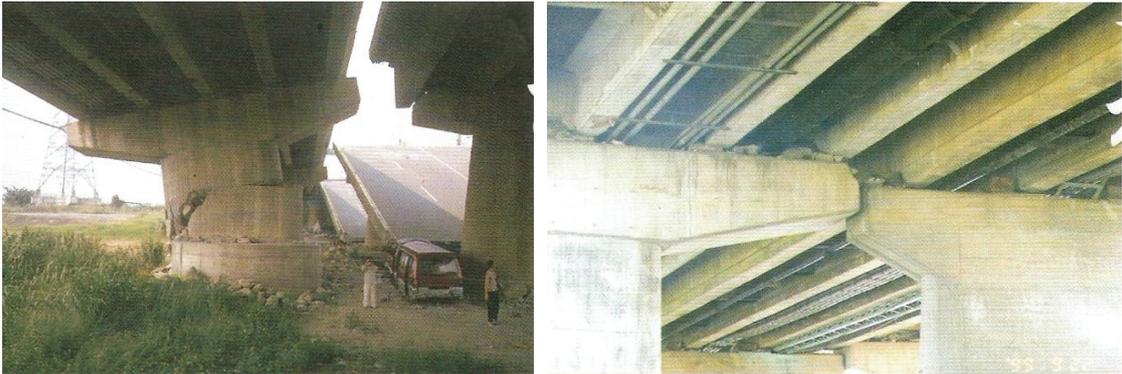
(Left) Collapsed spans and damaged piers of the Wu-Shi bridge at the third span
